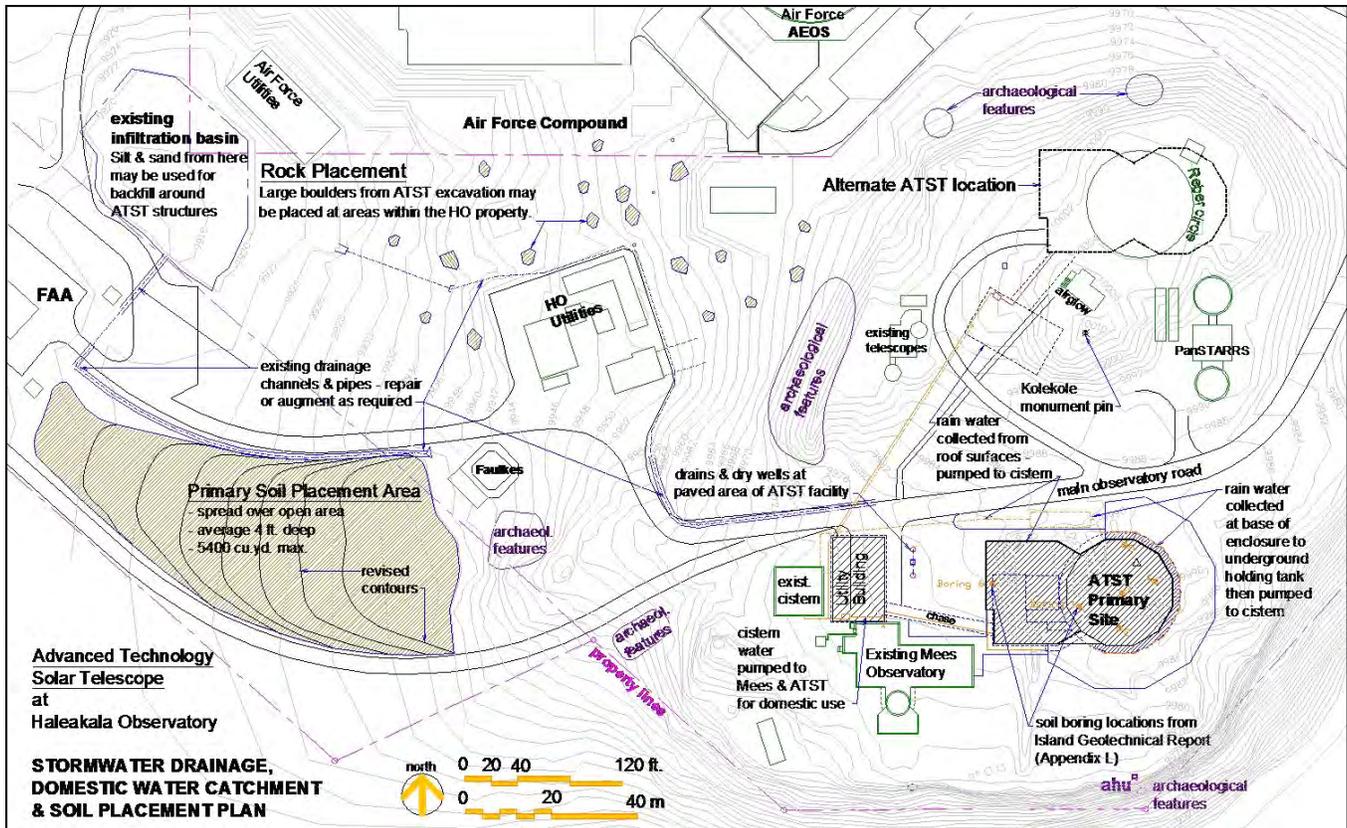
Soil Placement Plan, Stormwater, and Domestic Water Catchment.
